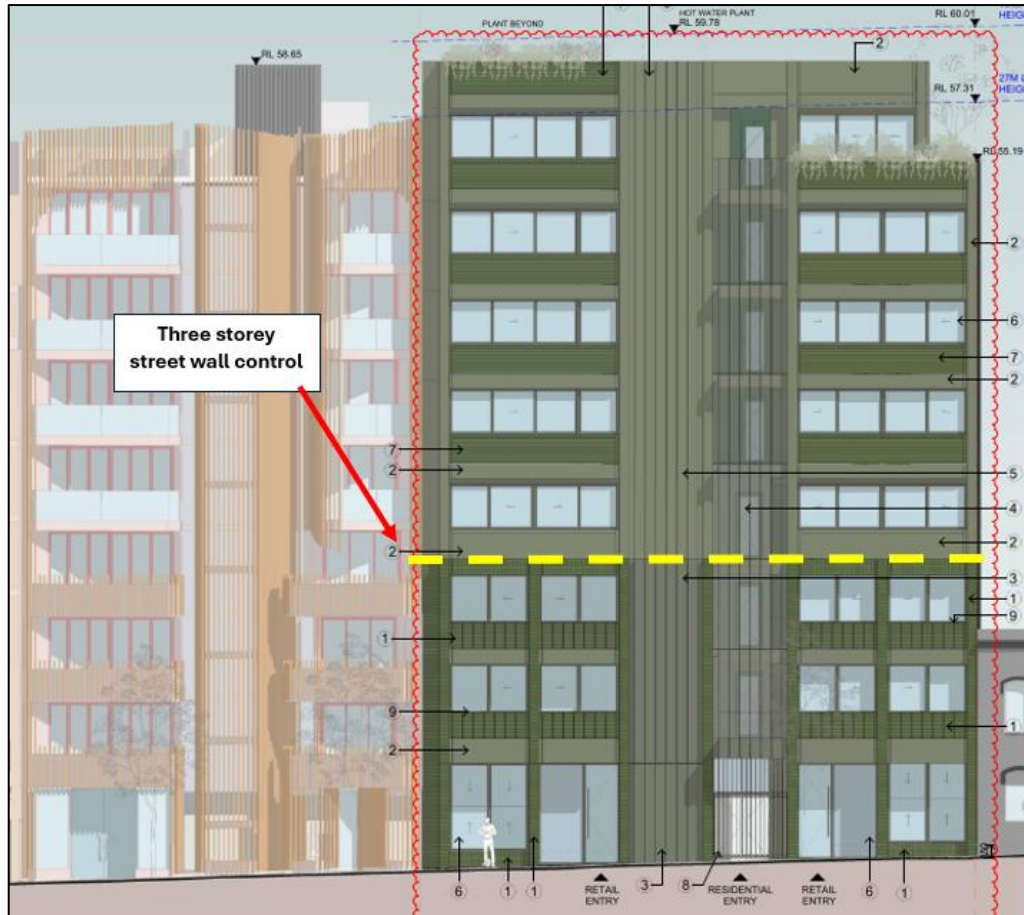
Cooper Street elevation, showing the change in architectural expression above and below the street wall
